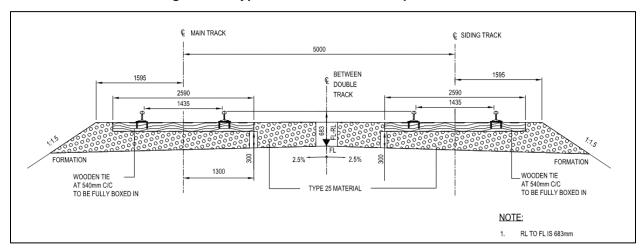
Typical Cross Section – Double Track in Sidings – Superstructure
